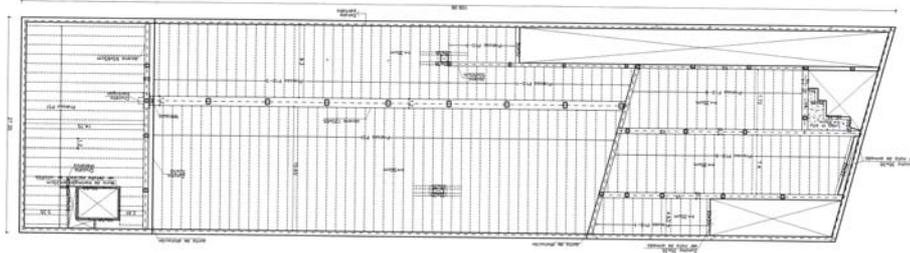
Structural floor plan showing the 17 x 55 m (56 x 180 ft) column-free area near the center of the building
